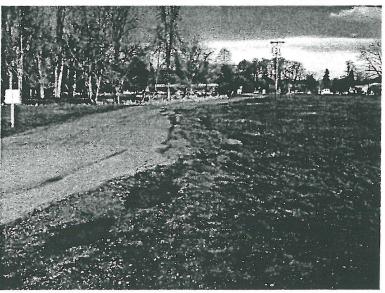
Photo C showing roadside ditch and former road location. This historic fill interrupts flow through the roadside ditch.
